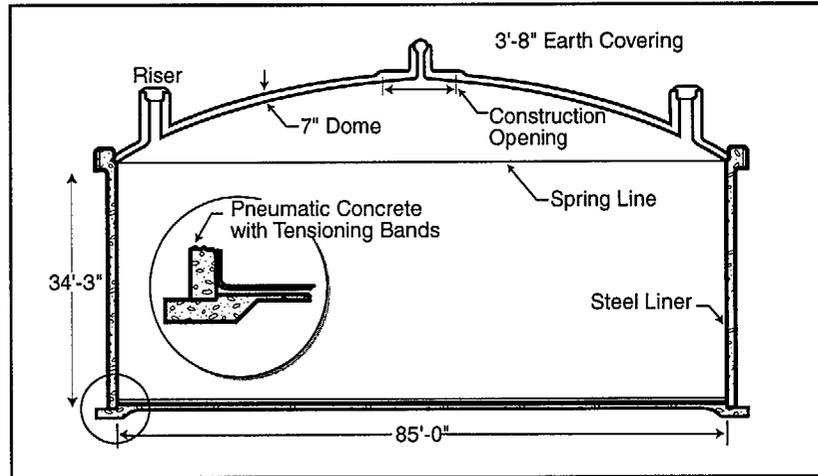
C. Uncooled Waste Storage Tank, Type IV (Prestressed concrete walls, 1,300,000 gallons)
